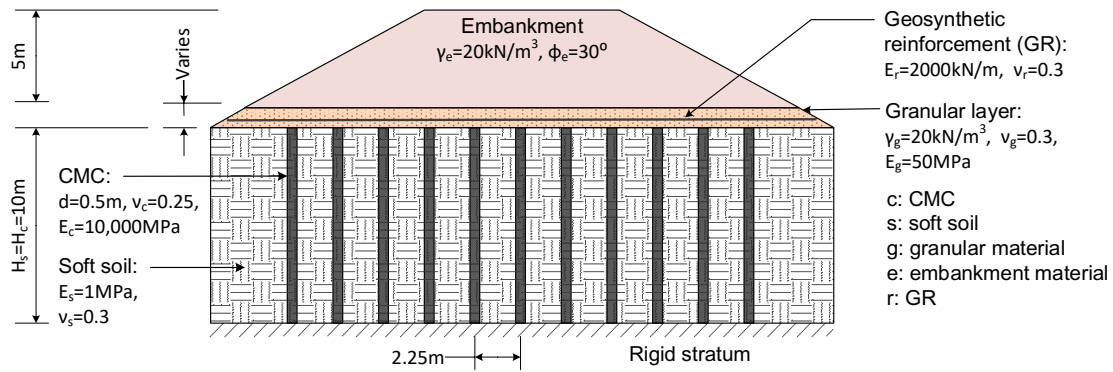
Typical cross section of a geosynthetic reinforced CIC supported embankment.
